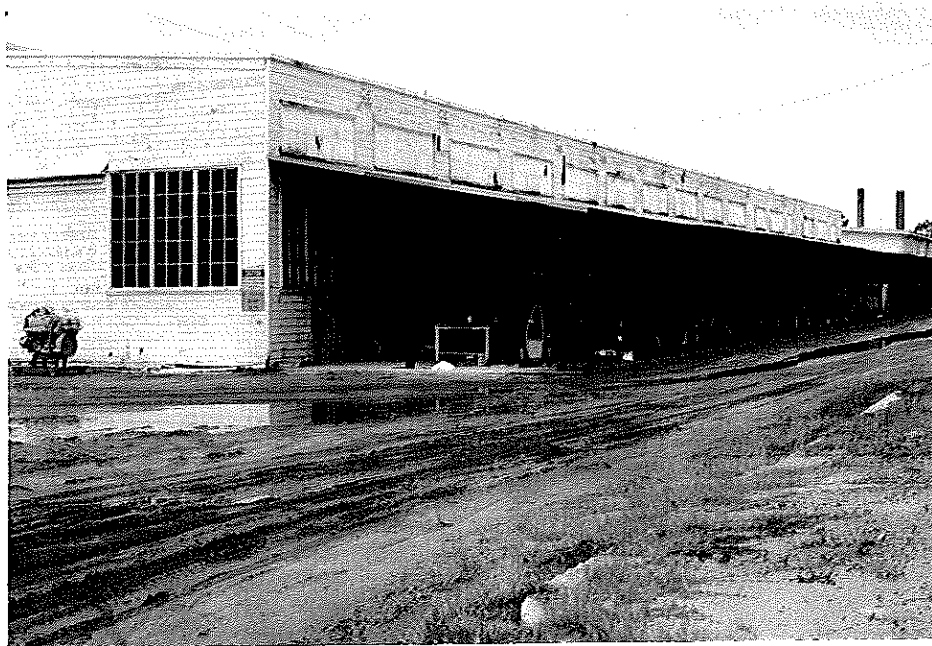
PHOTO NORTHWESTWARD, PAINT BOOTH WAS LOCATED IN NORTHERN CORNER OF BUILDING
